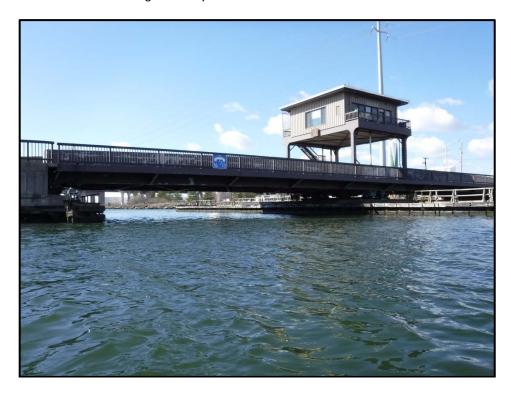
Chapel Street Bridge, looking south, photo taken March 18, 2016.
